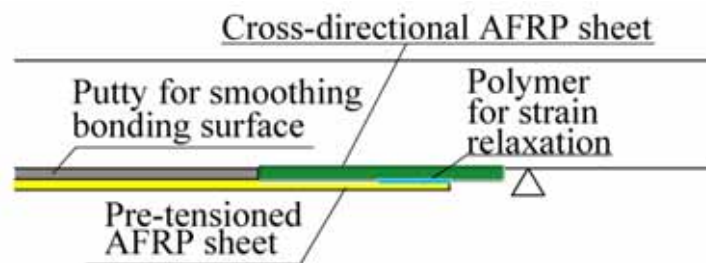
A proposed anchoring method of bonding AFRP sheet
